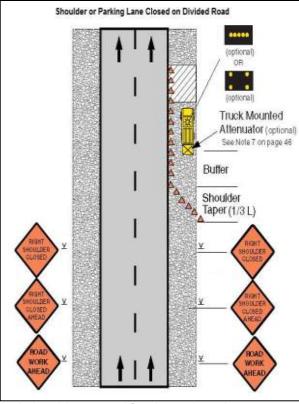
& A3: Work on shoulder or parking lane and shoulder or parking lane closed on divided road
